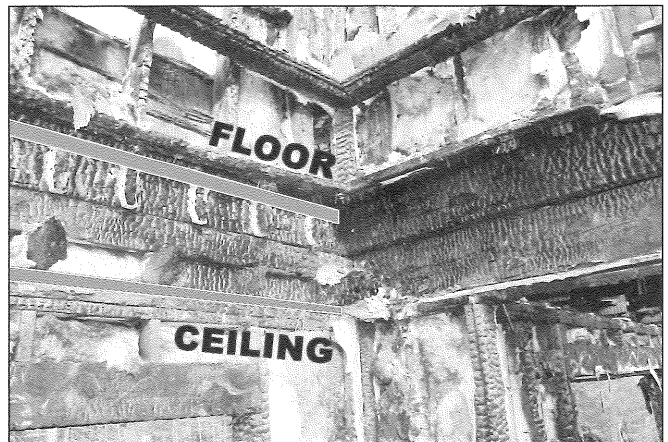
Void space from an actual fire in a modular home. Note that the first-floor ceiling joists and the second-floor trusses have burned away due to the intensity of the fire that was in this space. Courtesy of Kevin Gallagher.
